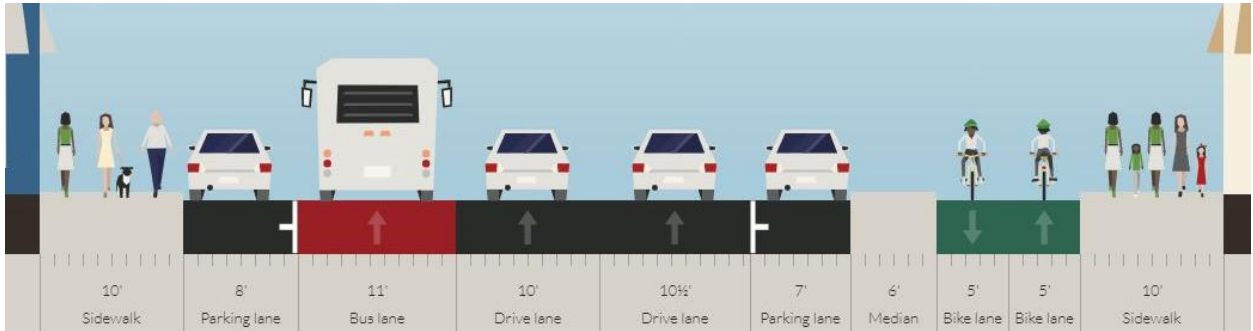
Typical Cross Section of Folsom Street between 5th and 4th streets and Mabini streets, looking east
